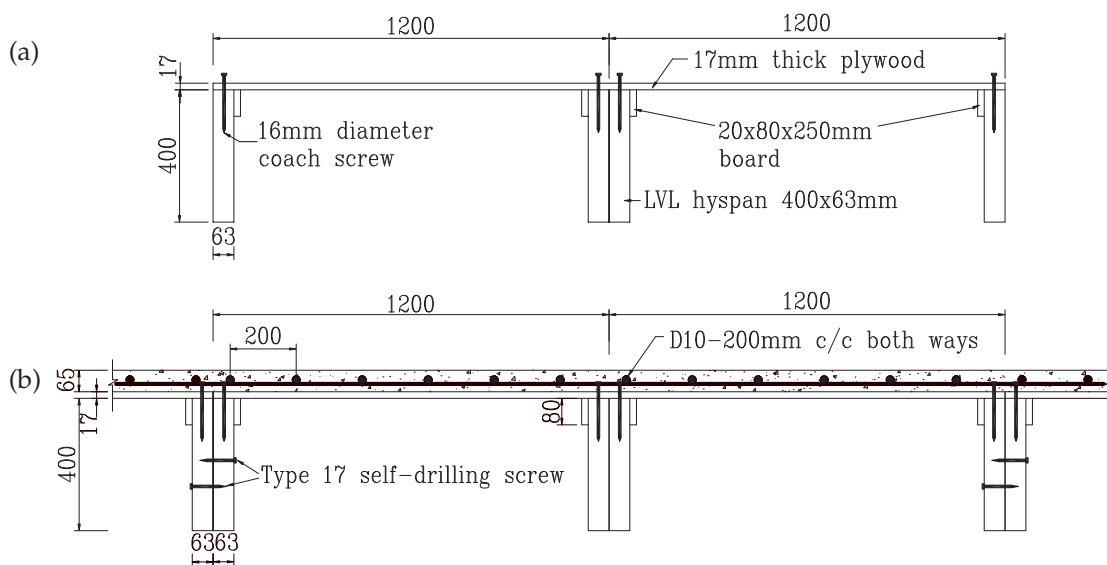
(a) Semi-prefabricated "M" section panel and (b) semi-prefabricated panel connected to adjacent panels with concrete slab (dimensions in mm).
